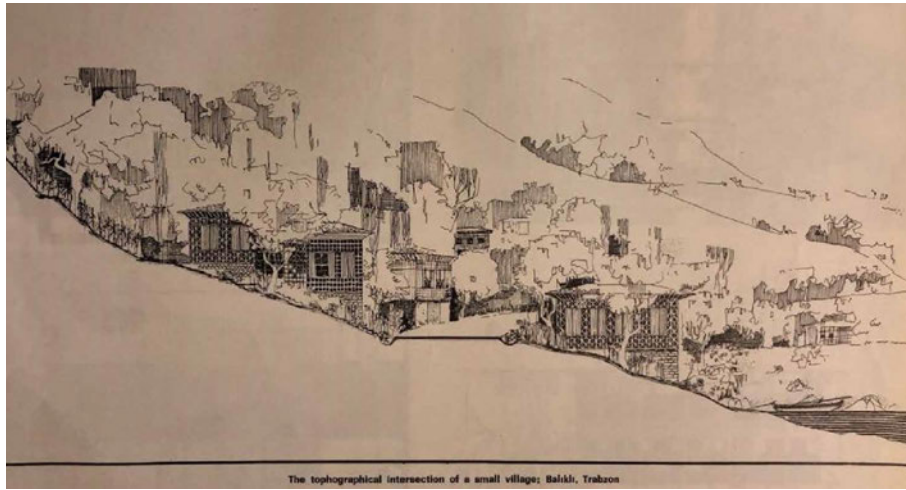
A sketch depicting the timber-framed buildings with the shape of rectangles and triangles on the frames. Each building faces a different angle not to disrupt the view of the neighbours. Source: Türkiye Turing ve Otomobil belleteni 1970 January, March No 25/304.
